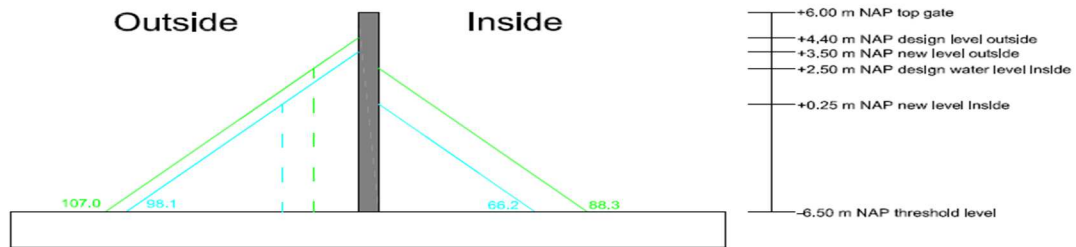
Schematic overview assessment existing gate, design level (green), new level (cyan)
